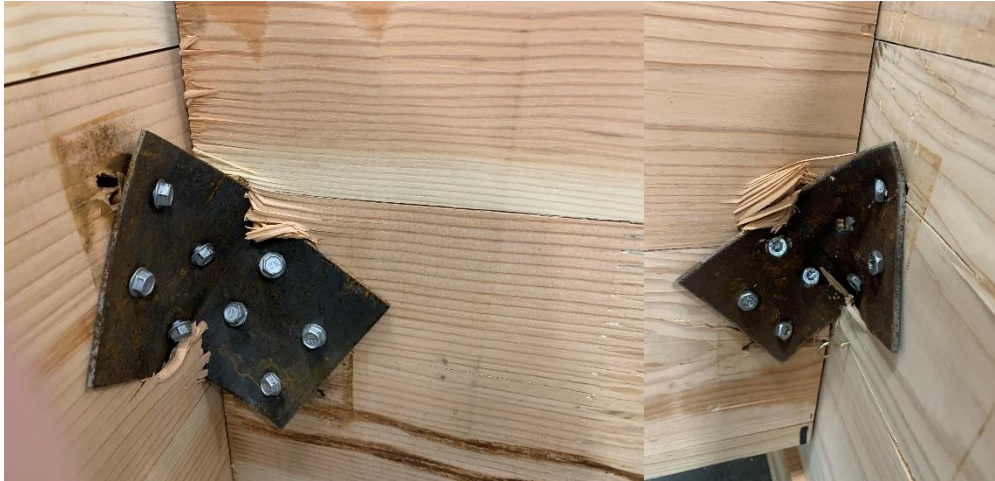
Load-Bearing Wall-to-Floor Monotonic Test Failure
